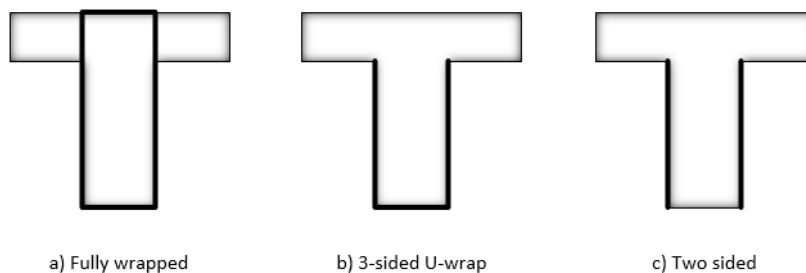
Concrete cross-sections strengthened in shear with FRP.
